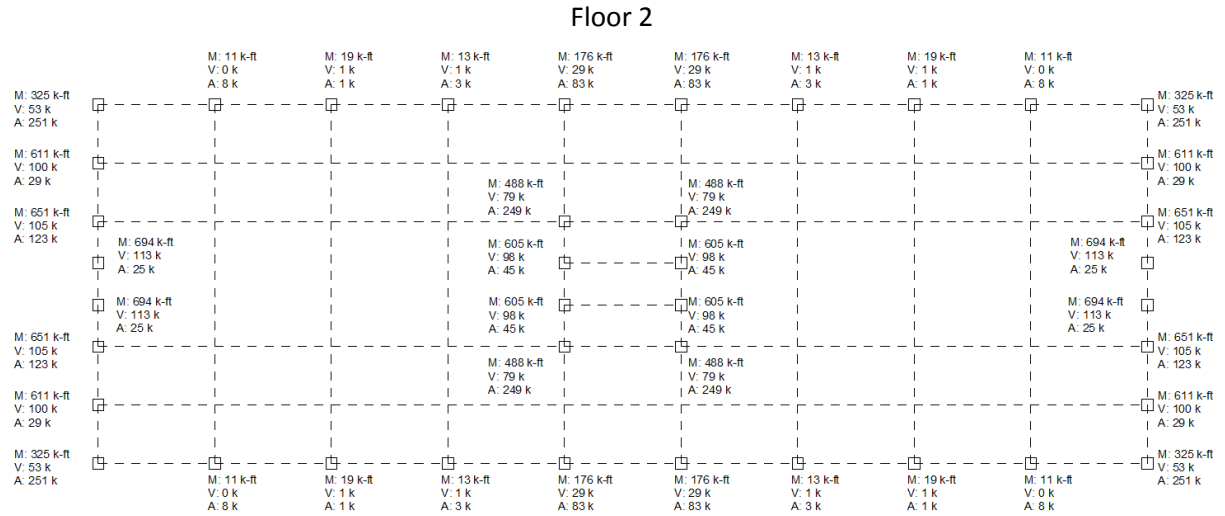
Maximum forces in the second floor columns due to tsunami base shear
